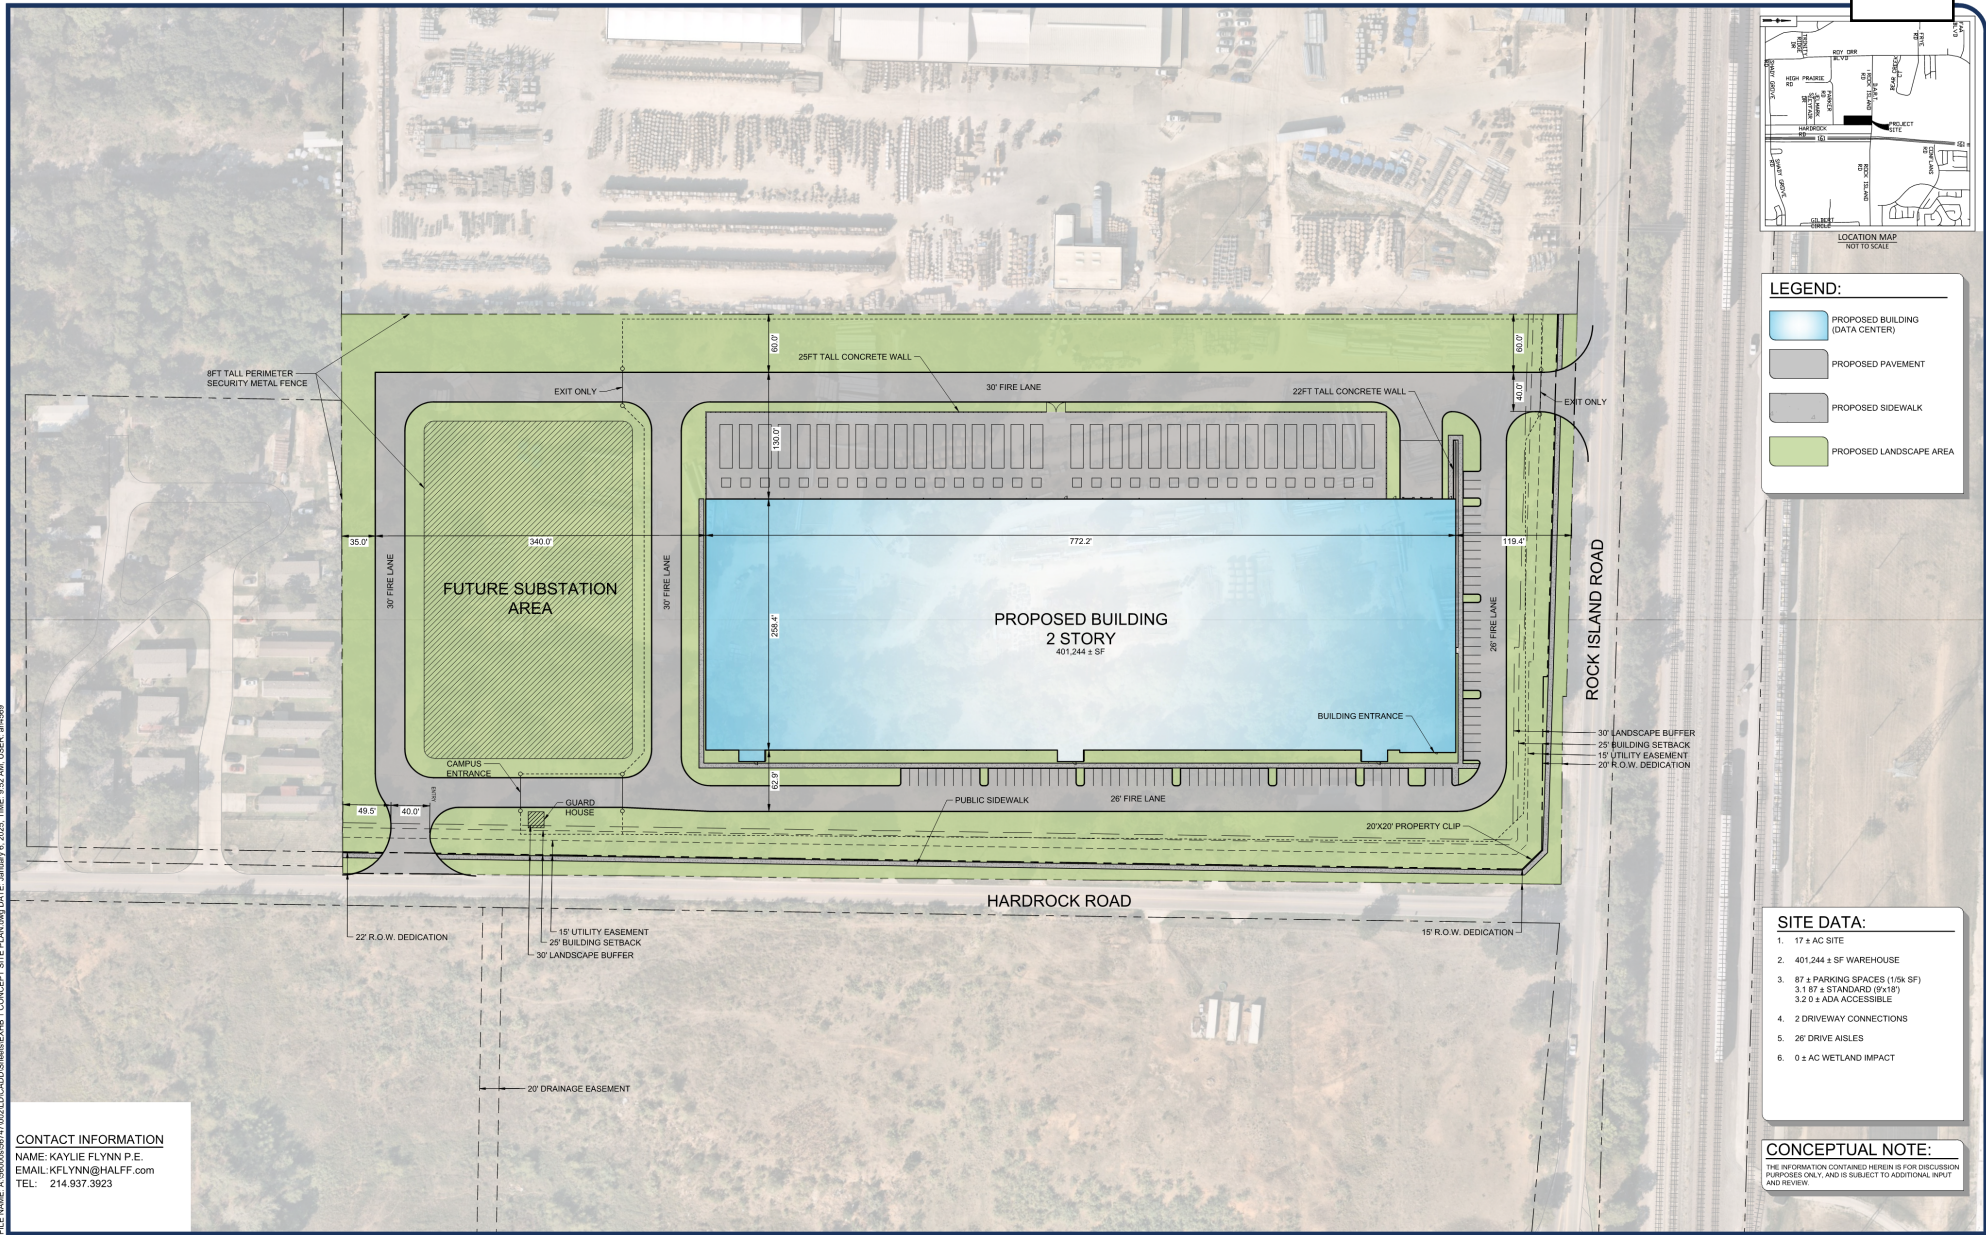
CONCEPT PLAN: ZON-24-12-0030
